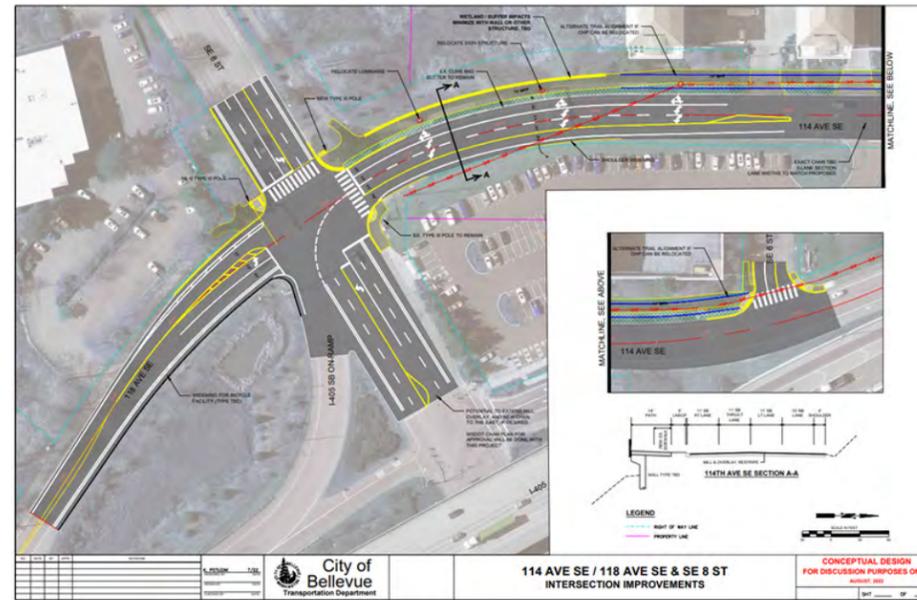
City of Bellevue planned Improvement 114th Avenue Southeast and 118th Avenue Southeast and Southeast Eighth Street.
